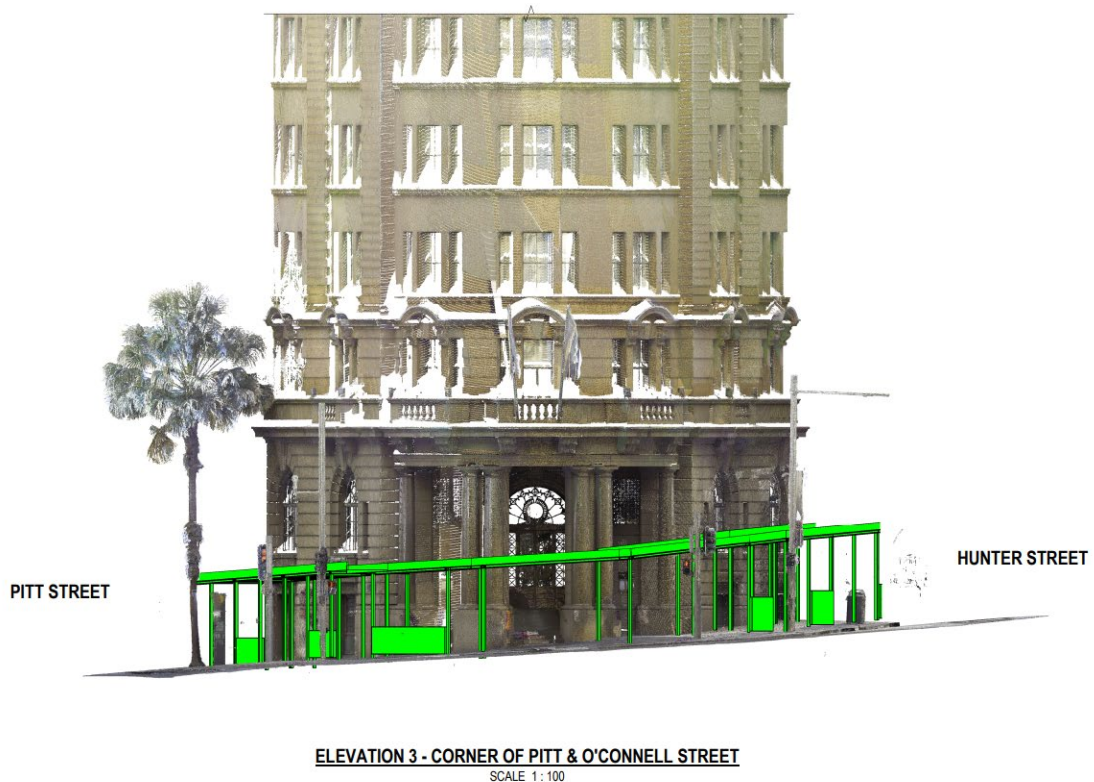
Indicative Concept design of Raddison Blu (note hoarding will be designed as per Appendix B when installed on site).
